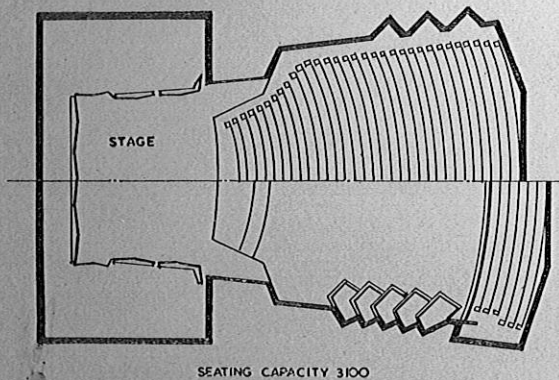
LA GRANDE SALLE, PLACE DES ARTS, Montreal, showing fan shaped floor plan; the sides are broken by tiers of boxes.
